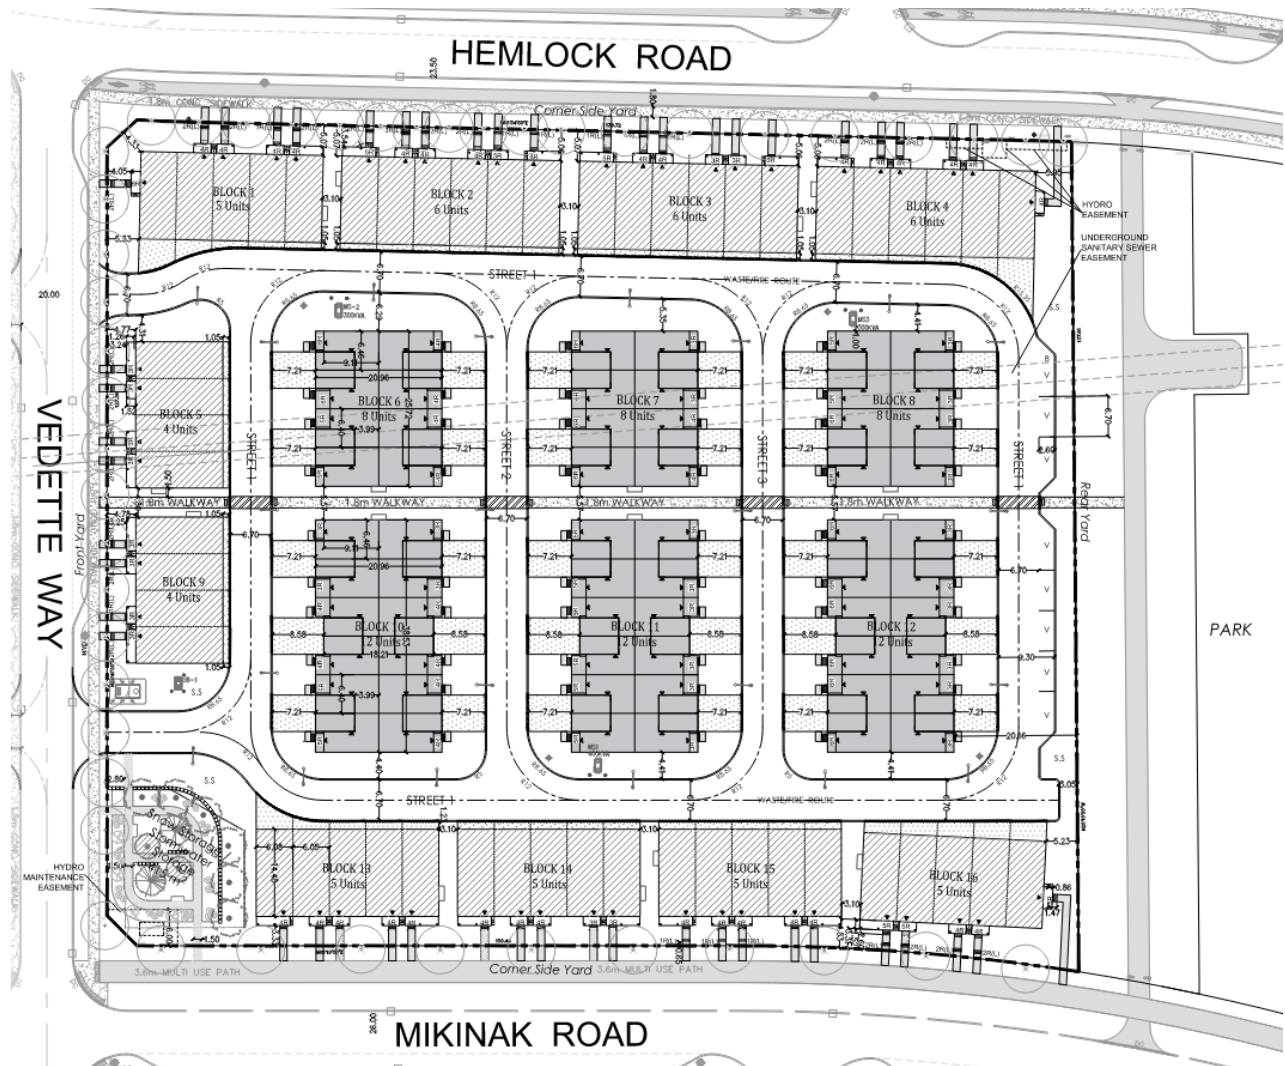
Site Plan Excerpt (Korsiak Urban Planning).
